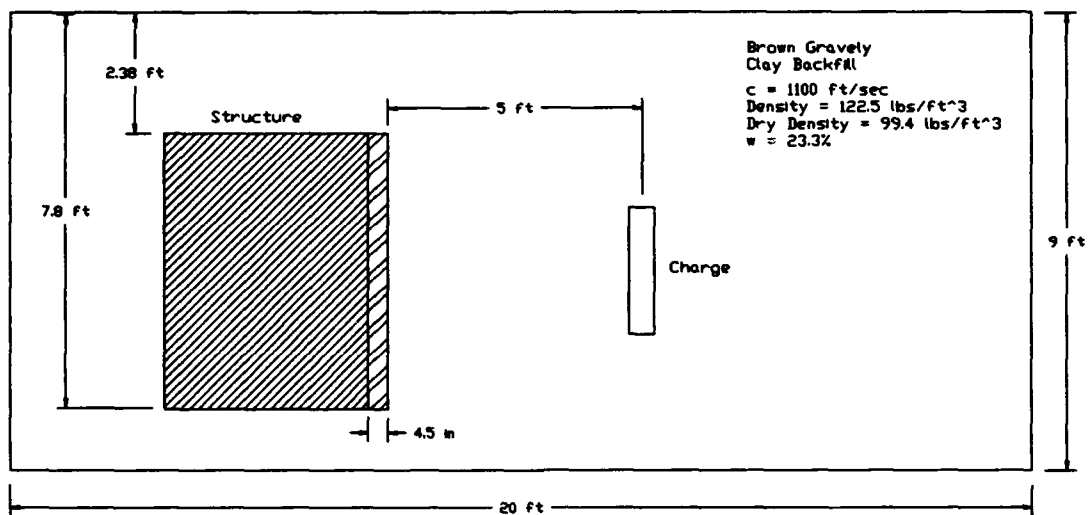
Section through CONWEB 1 test bed, showing backfill properties.
